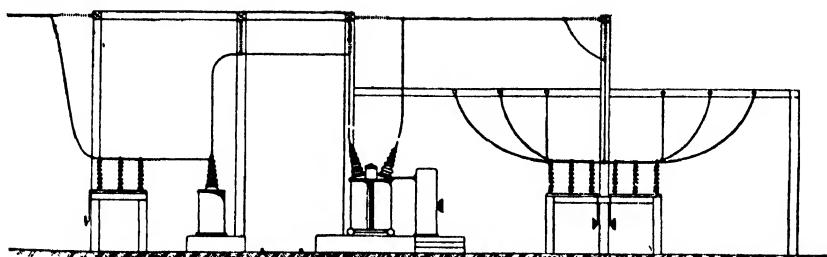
Showing Outdoor Types of Transformer Stations with a Minimum Amount of Structural Work.
